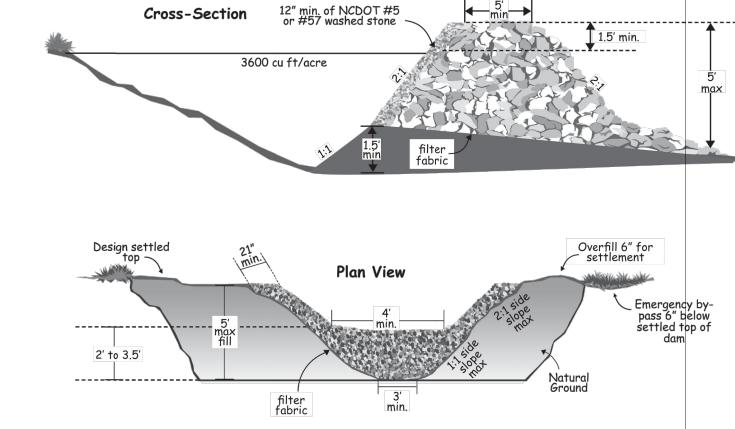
Plan view and cross-section view of a temporary sediment trap.
